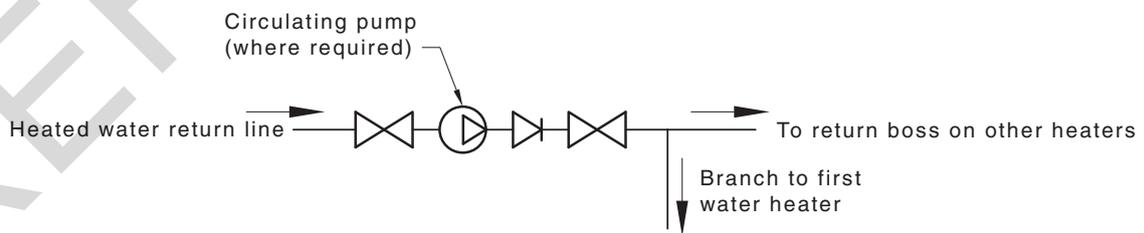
(A) TYPICAL IN-LINE ARRANGEMENT OF MULTIPLE STORAGE WATER HEATERS
